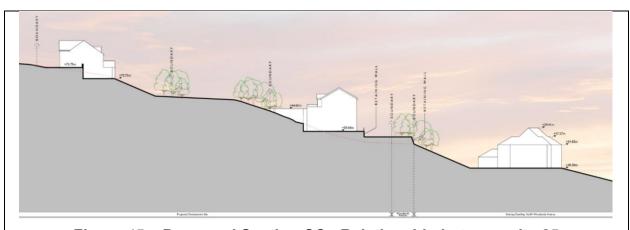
Proposed Section CC - Relationship between site 25 (House Type L) and No. 1 Woodlands Avenue
